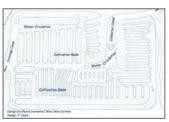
Plan View of a Pluvial Waru Waru designed system. (Source: Murillo, 1992) Scale guide – platform length ranges from 15m – 50 m
